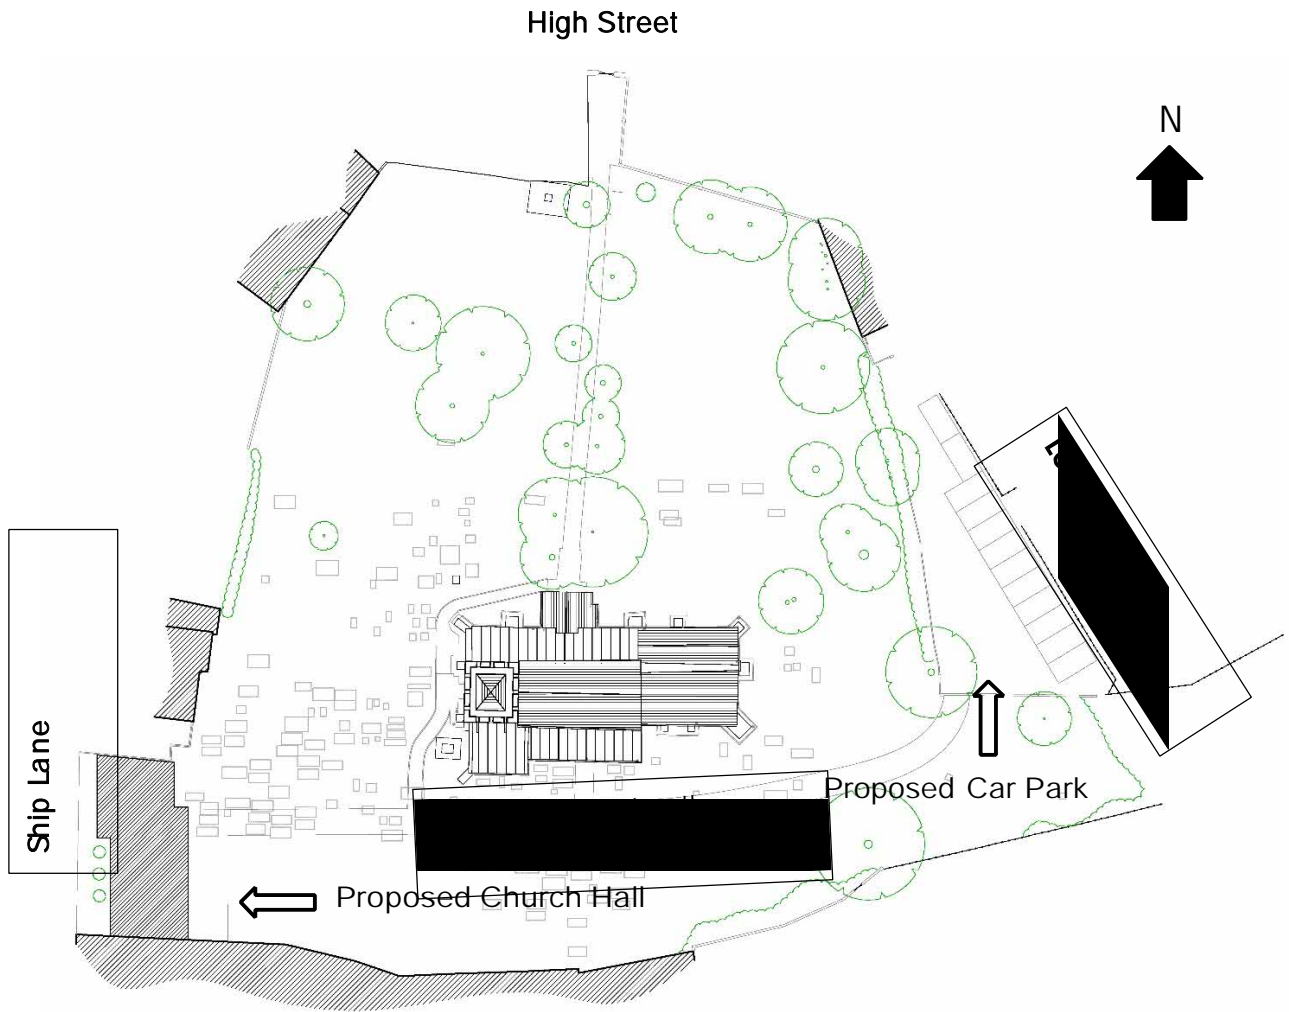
Site Plan showing proposed church hall, car park and footpaths
